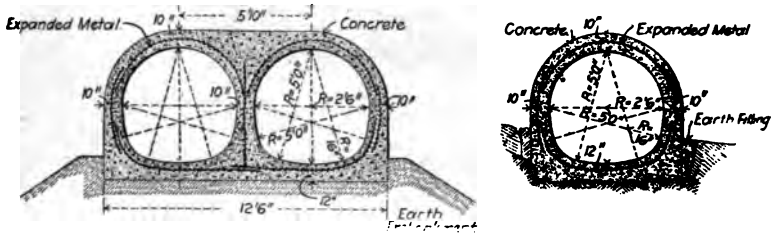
Conduits, Cedar Grove Reservoir, Newark, N. J.
